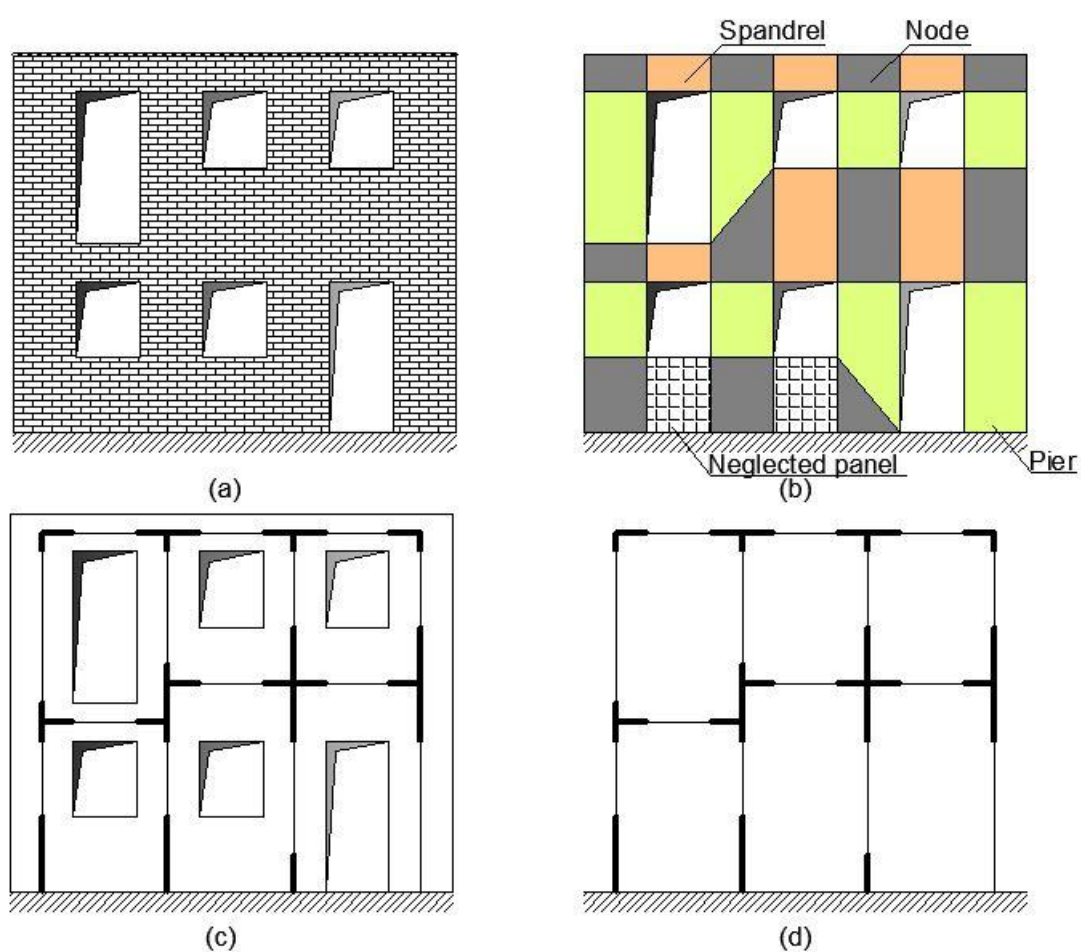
Equivalent frame modelling strategy. (1) masonry wall geometrical layout; (2) identification of piers, spandrels and regions assumed as rigid; (3) frame model superimposed to the wall geometry; (4) equivalent frame model
